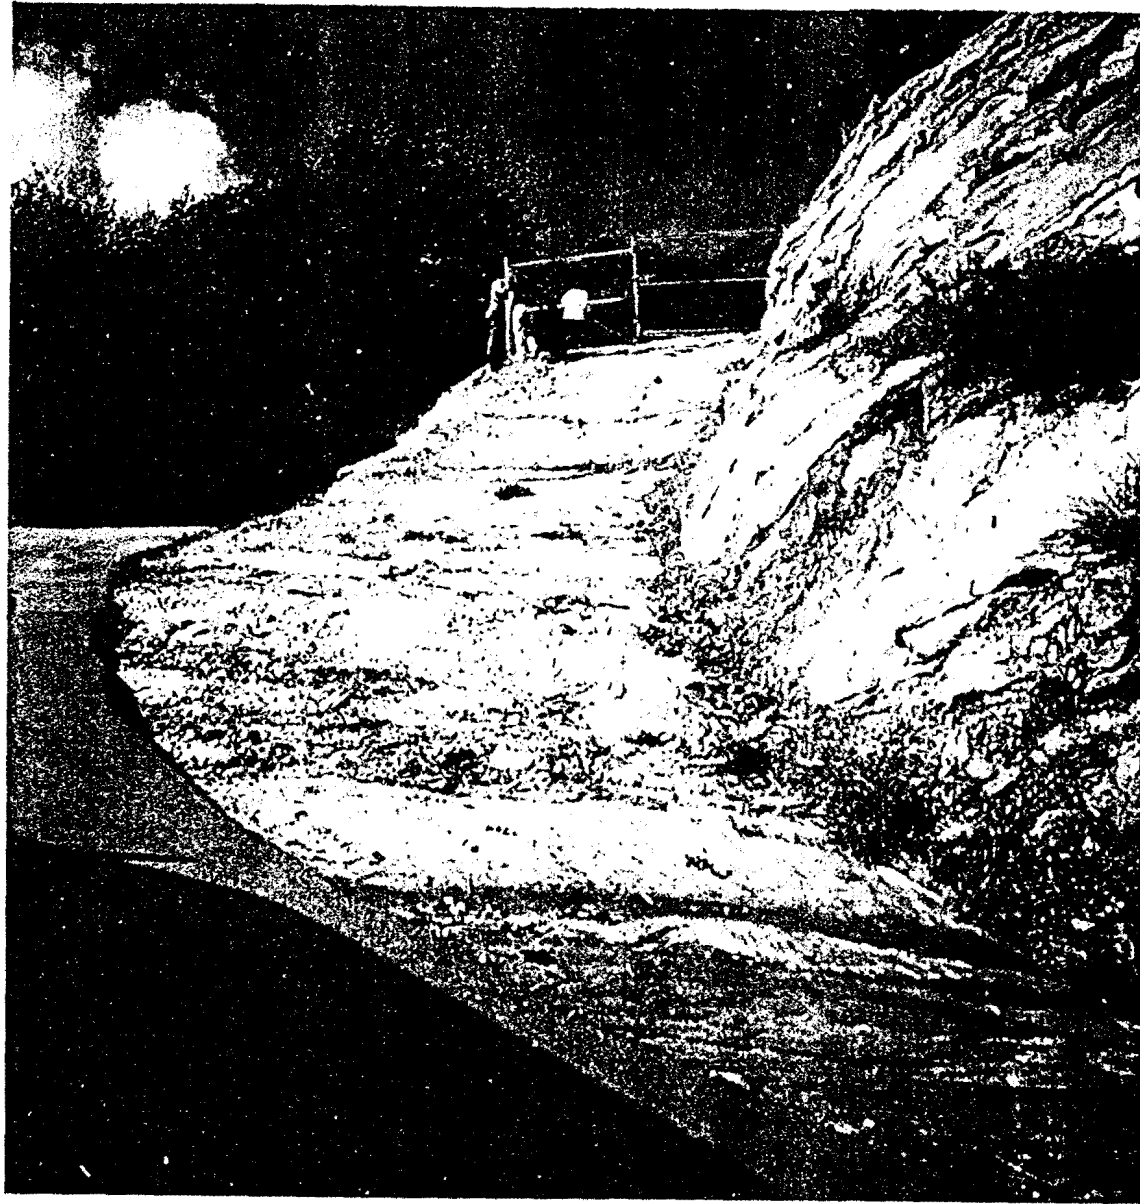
Driveway leading to building site, with access road below. View is to the west.
